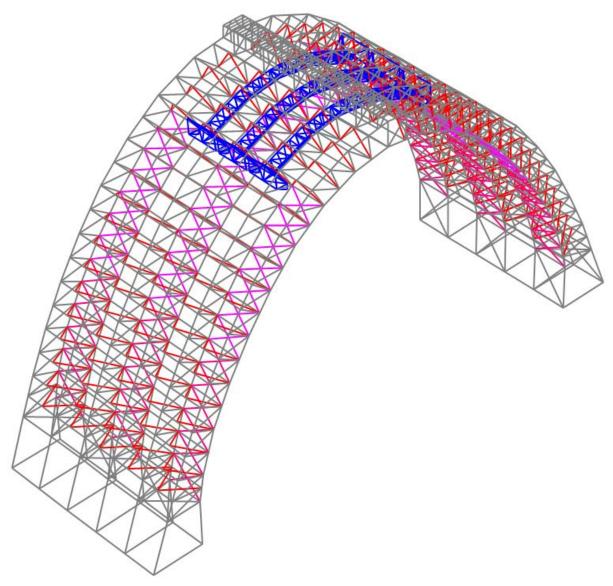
3D Isometric of Exoskeletons Installed between Existing Wood Trusses
